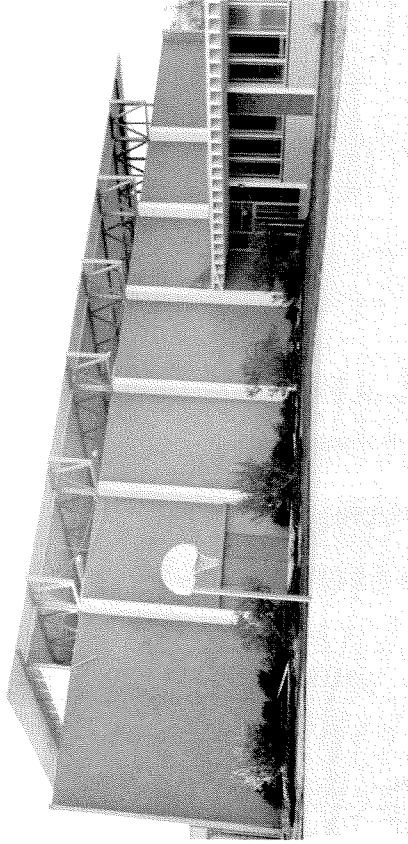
Gymnasium building. Cross-bracing rods between trusses were broken and safety glass window panes were shattered. (See preceding photo). San Fernando Juvenile Facility.
